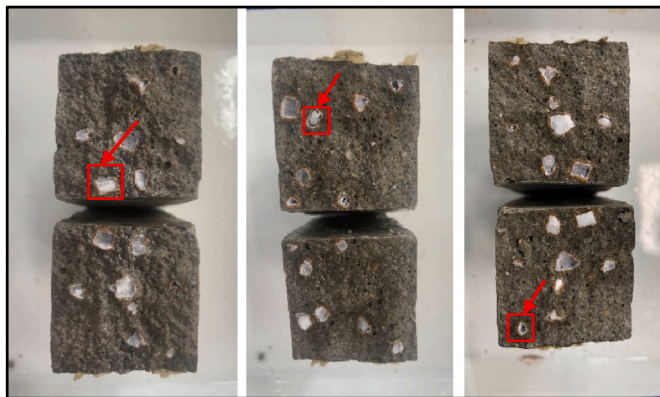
Fracture section diagram of CA-B capsule mortar specimens.
